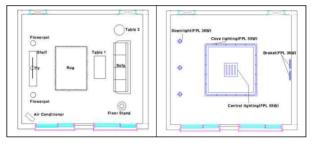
Laboratory Floor Plan & Ceiling Plan
